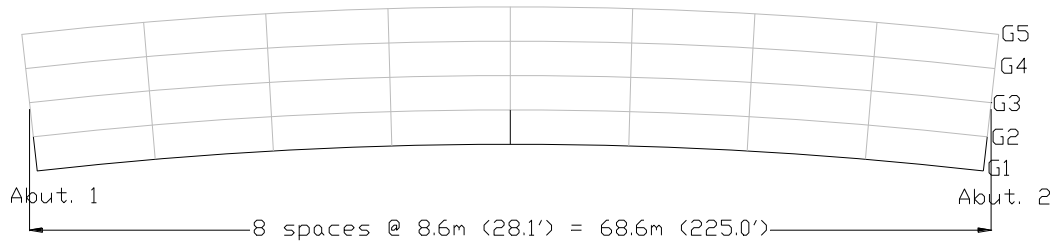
Stage 1 of Construction for Single Girder (Inner Girder Placed First) Erection of Single-Span, 5-Girder, 305-m (1000-ft) Radius Bridge.
